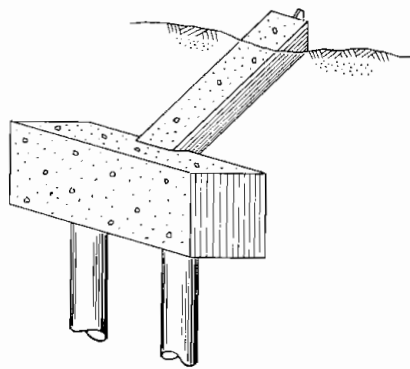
Reinforced-concrete guy anchor on piles for use in poor soils.
